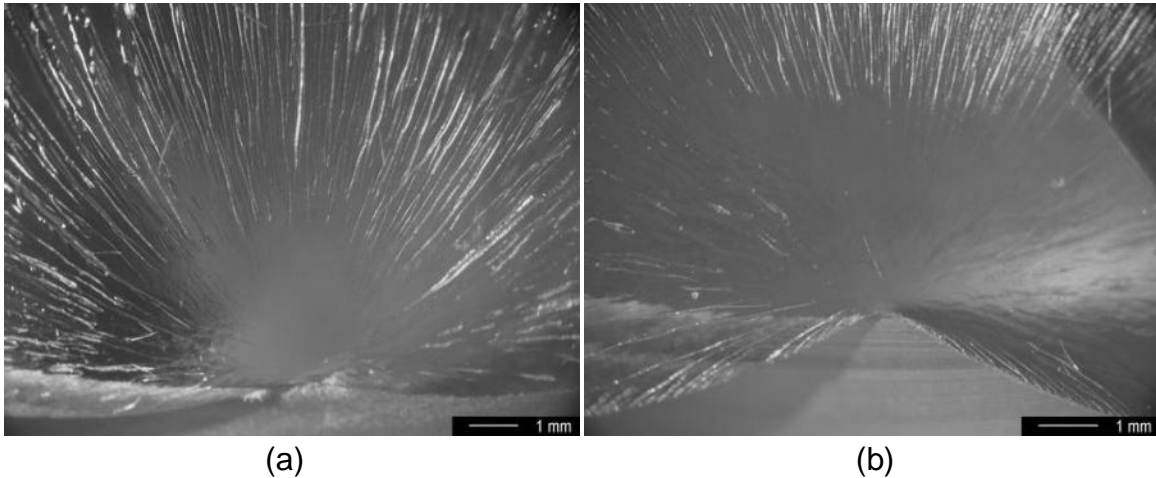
Images showing the fracture surfaces of (a) GB2-1 and (b) GB2-6.
